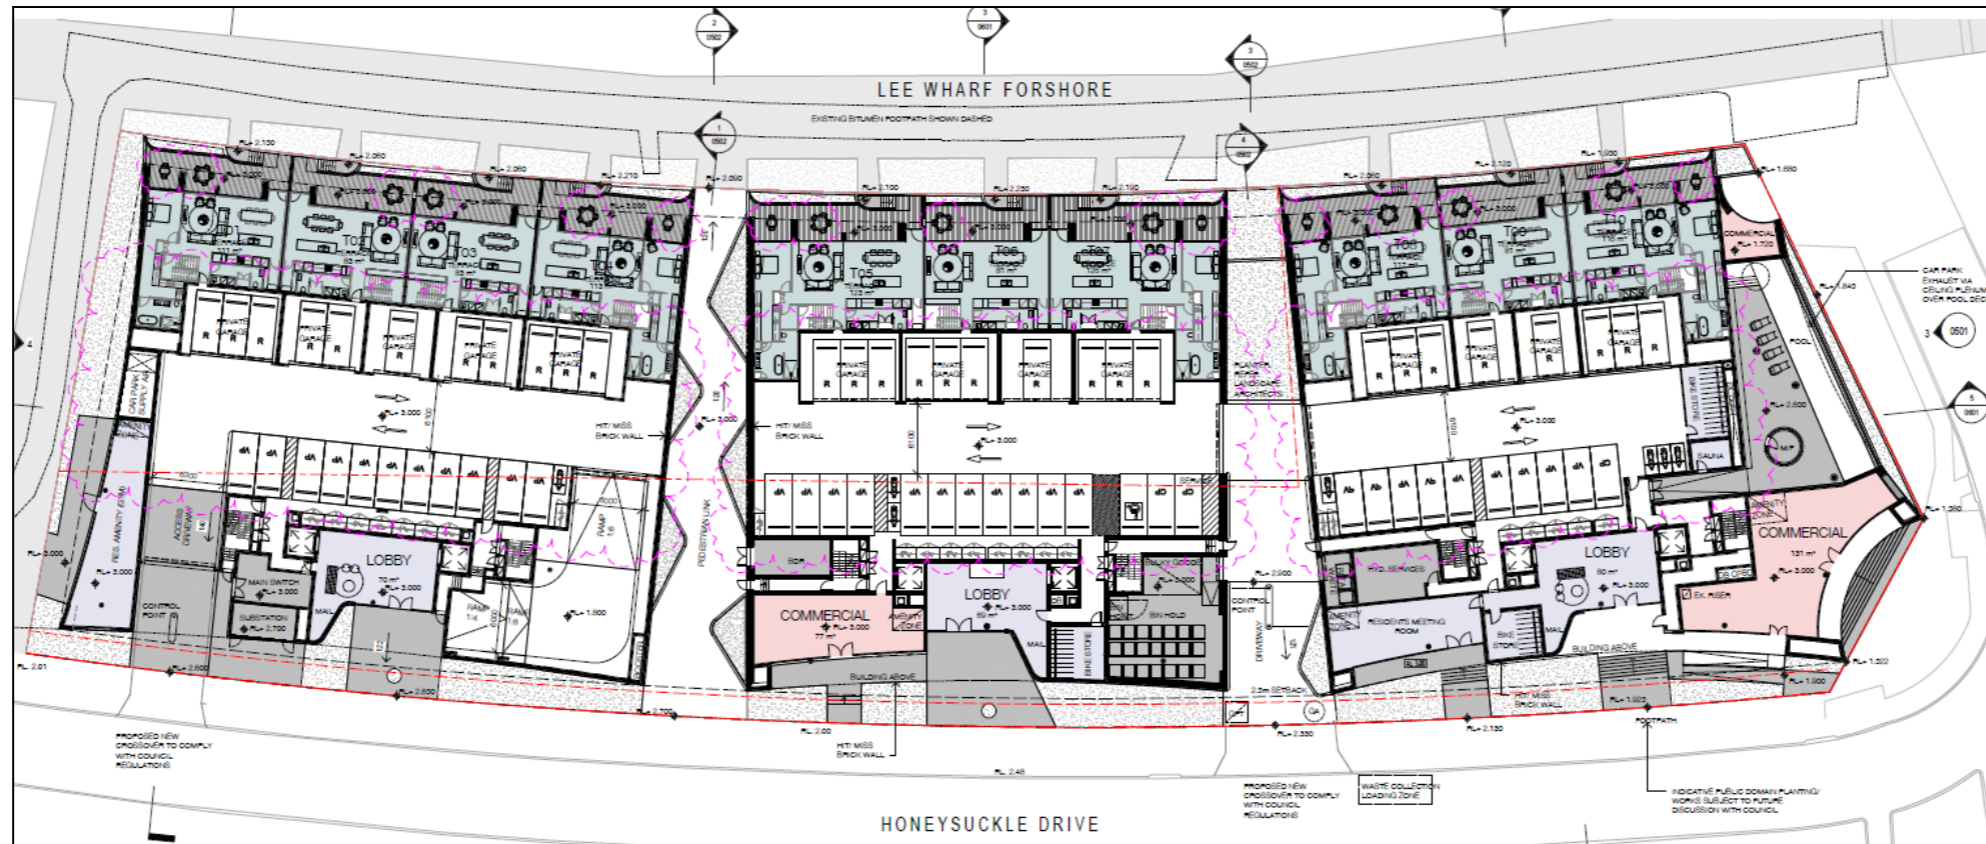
Ground floor plan (Source: Applicant's architectural plans)
